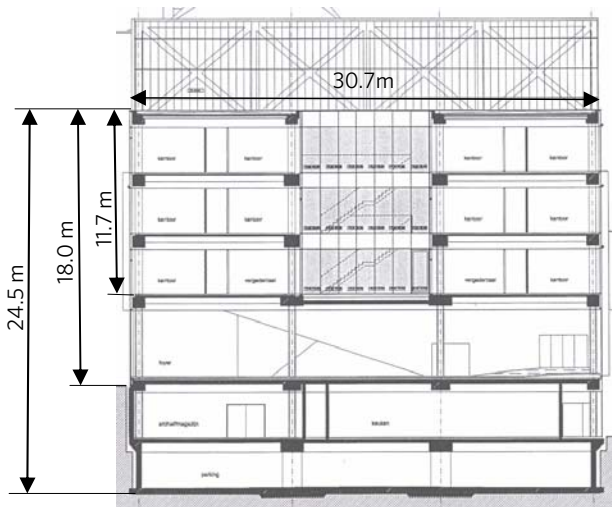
Cross section of the new office buildings “Sint-Pietersnieuwstraat” (Ghent University)
